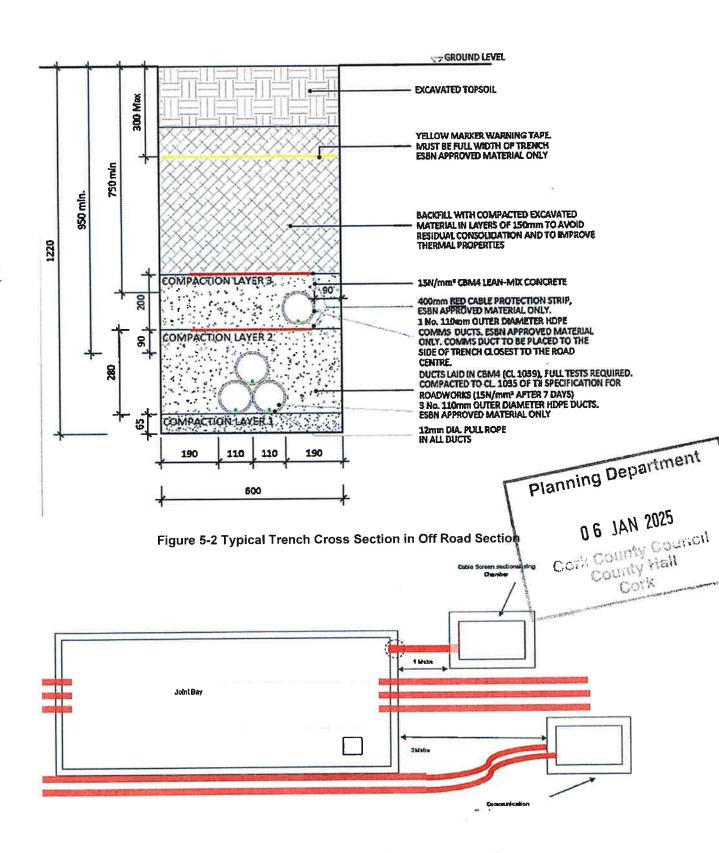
Typical Joint Bay and Link Box Plan Detail
